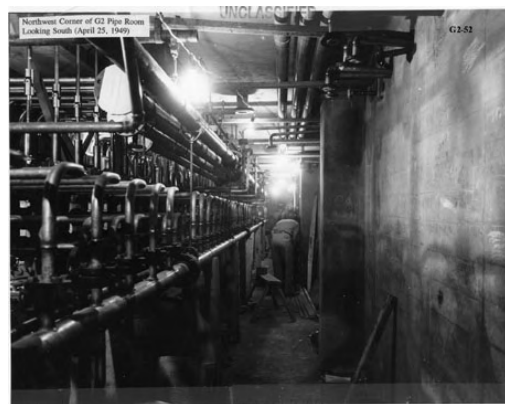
Photo G2-52, Northwest Corner of G2 Pipe Room Looking South, April 25, 1949
